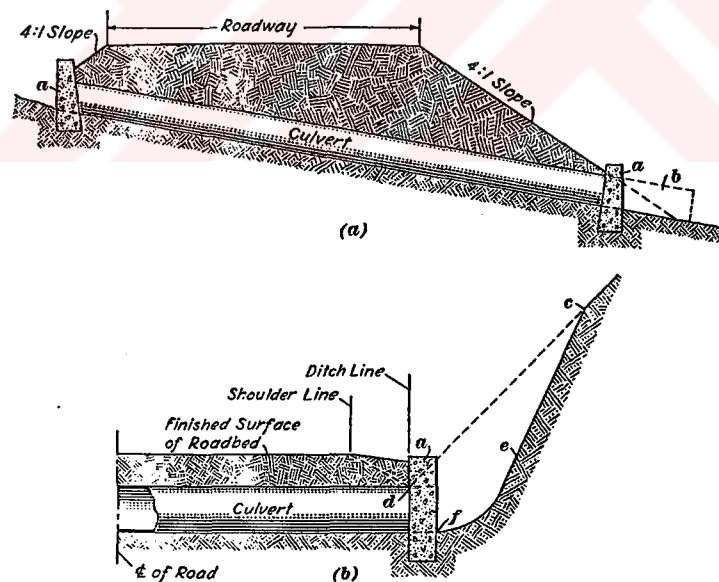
Proper installation of pipe culverts (a) in fill and (b) in cut (Bruce&Clarkeson, 1960)
